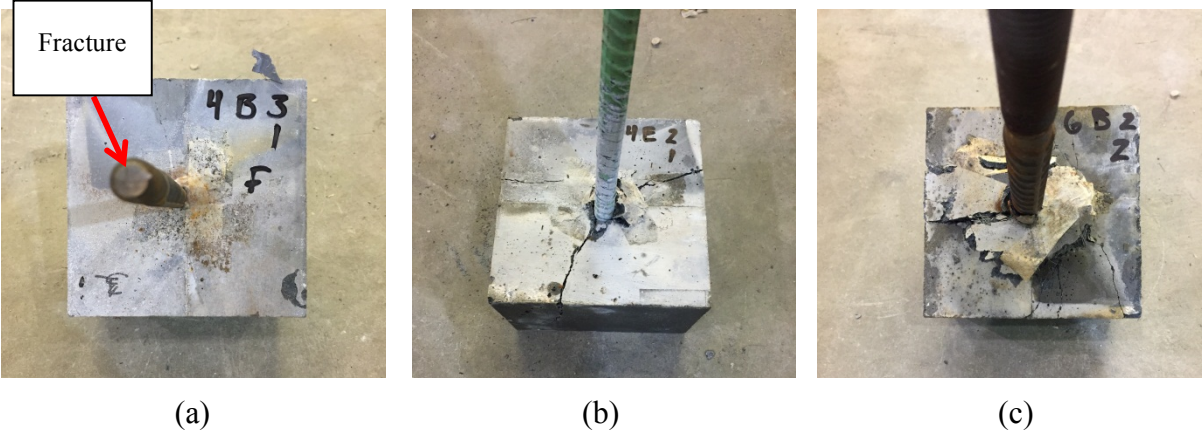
(a) Bar Fracture, (b) Bar Slip, and (c) Conical Concrete Failure
